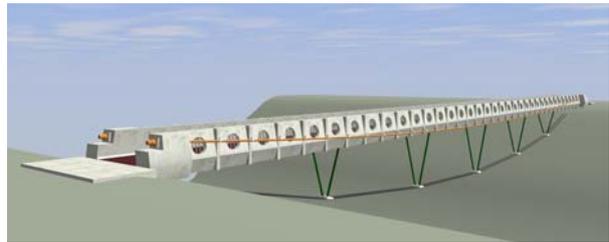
Suspension cable supporting roads above, construction top down, Seishun Bridge, (Gumma prefecture and Sumitomo)
